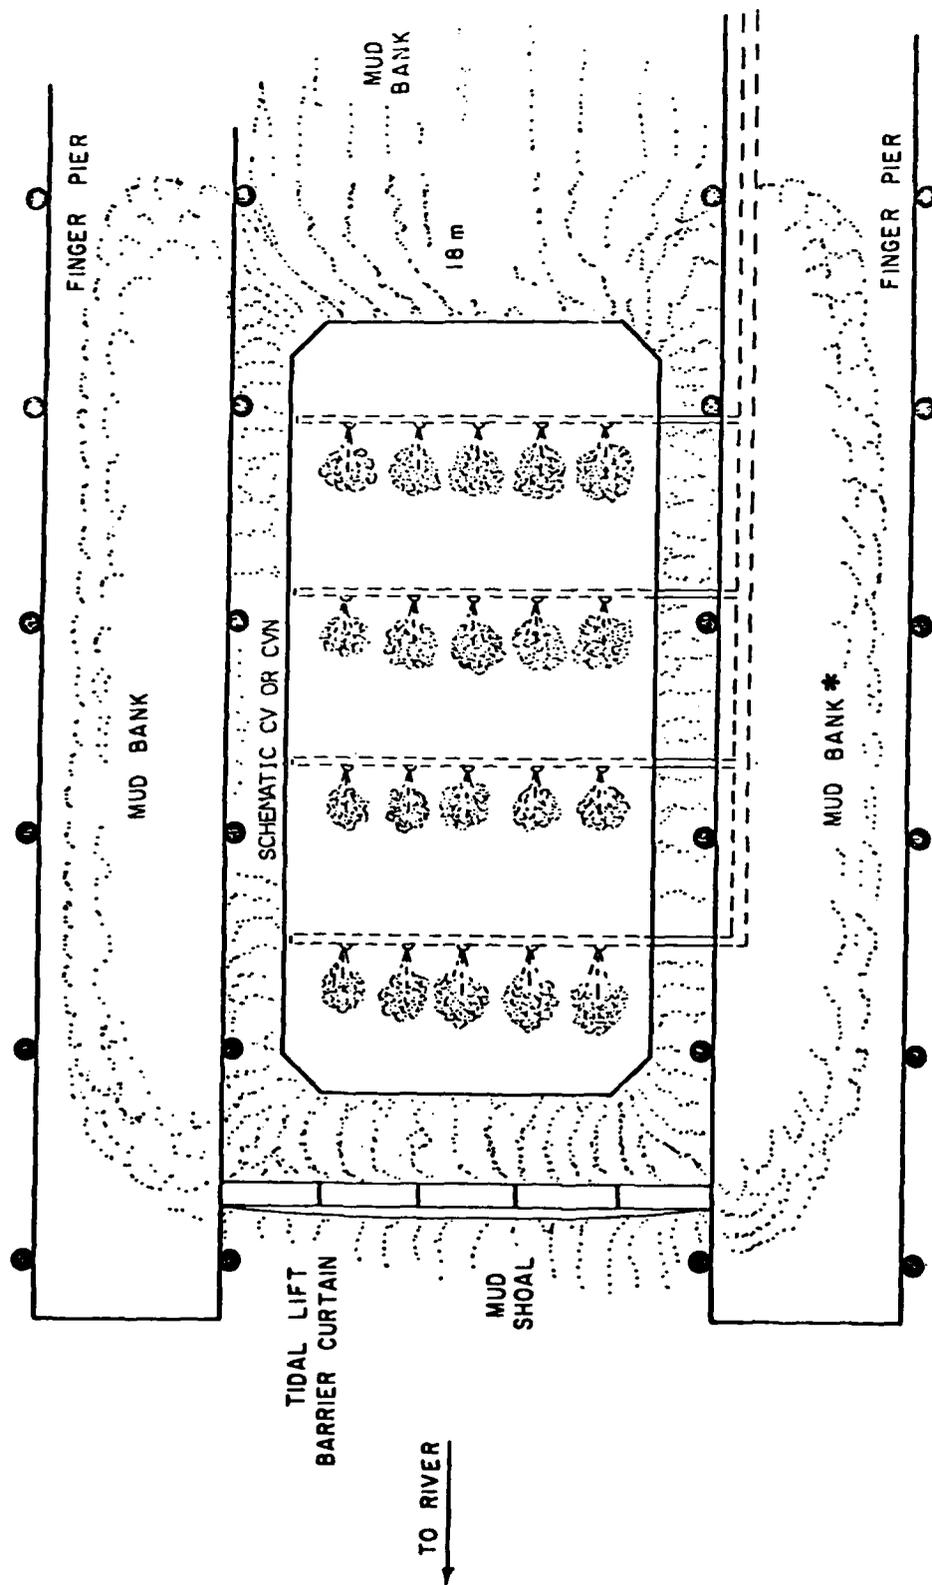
Norfolk Naval Station Proposed Pier 11 Complex with Barrier Curtain Protection Against Mud and Hydrooid Intrusion
